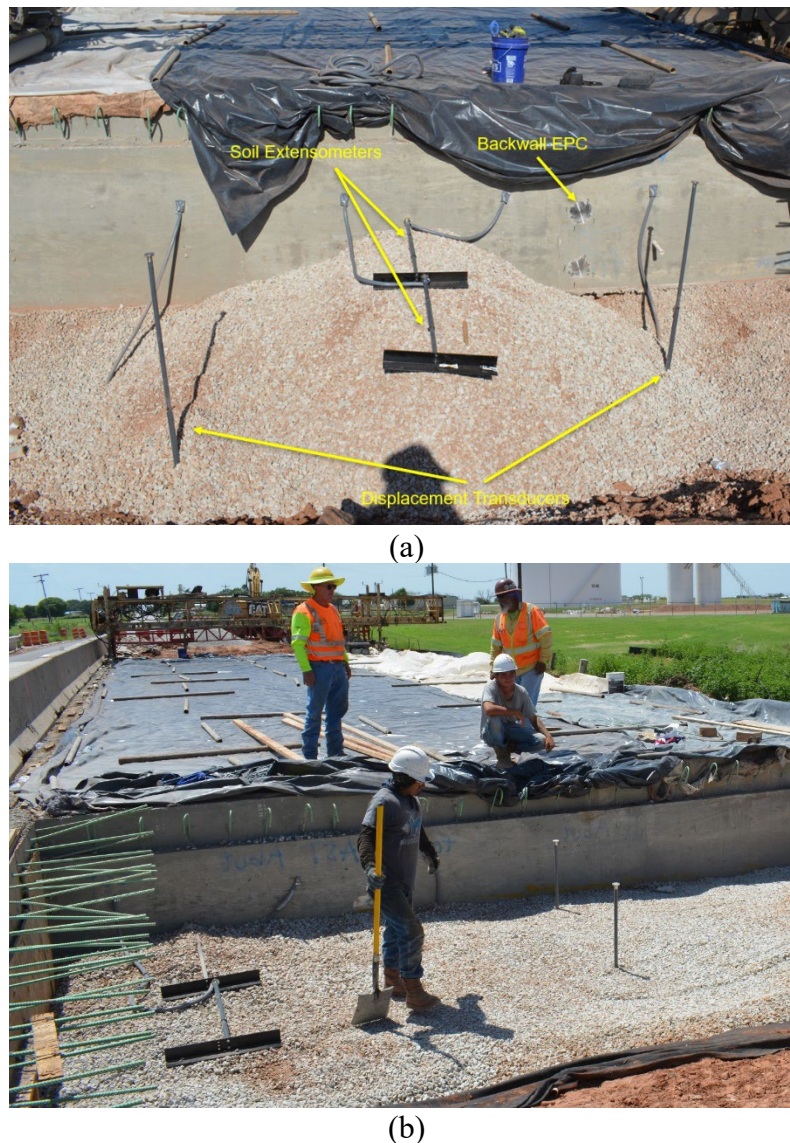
Soil extensometer installation in backfill: (a) west abutment; and (b) east abutment
